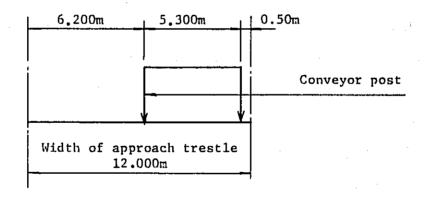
Conveyor Load Positions on Unloader Pier
